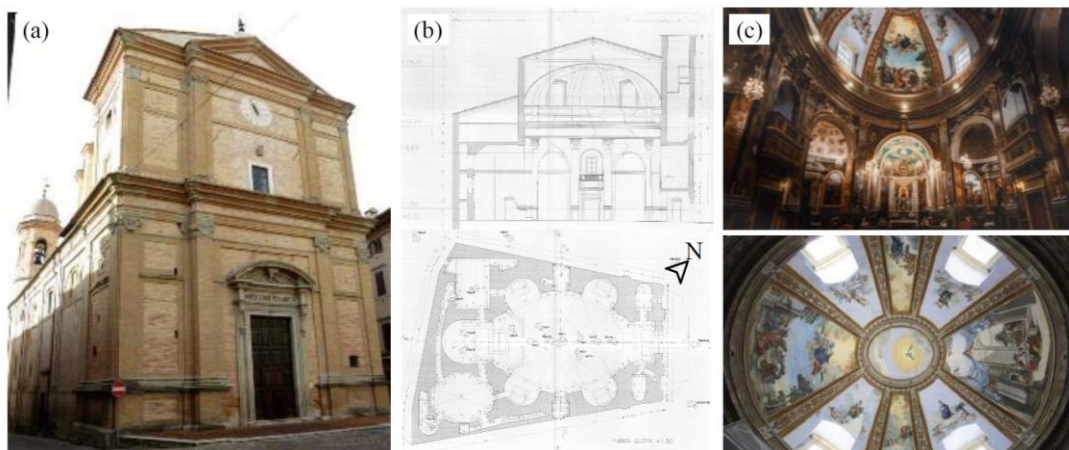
Santa Maria in Via church: (a) exterior picture, (b) architectural drawings, (c) interior pictures.
